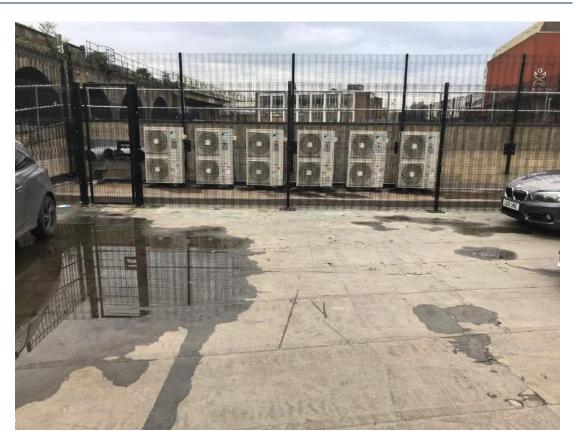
Air conditioning plant located within the staff carpark on the roof.
